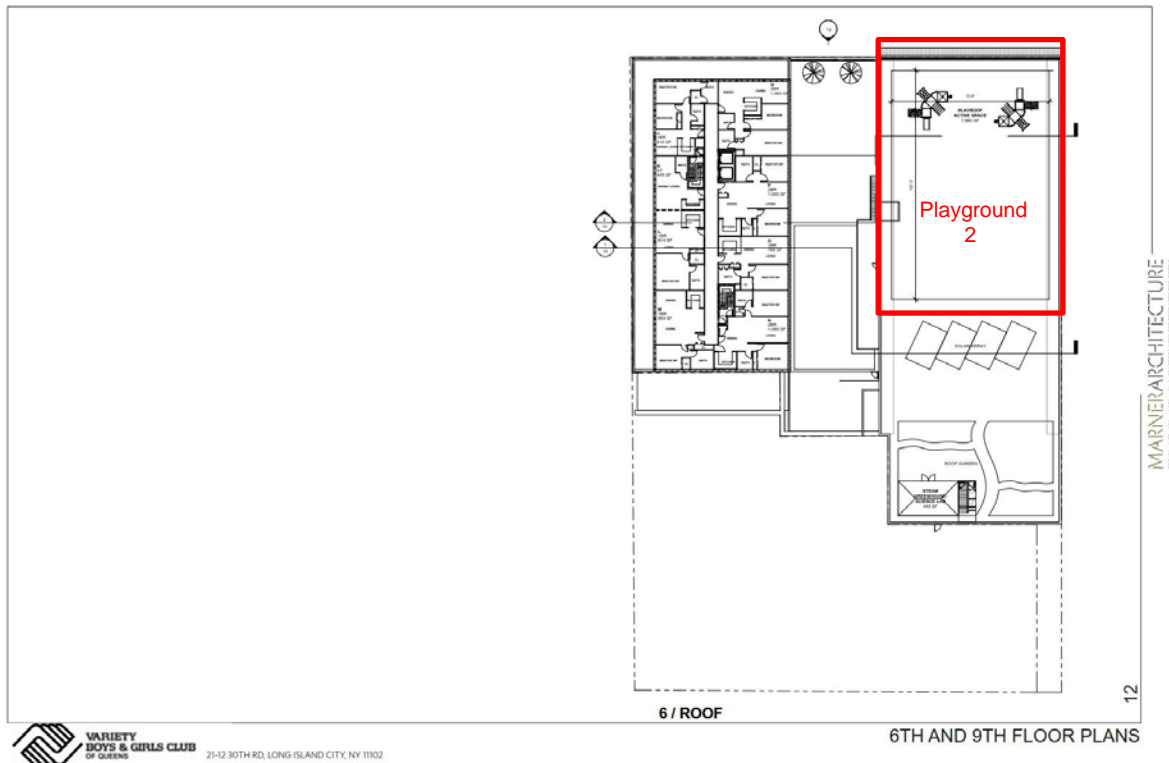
Floor Plan for Rooftop of Community Facility Component
